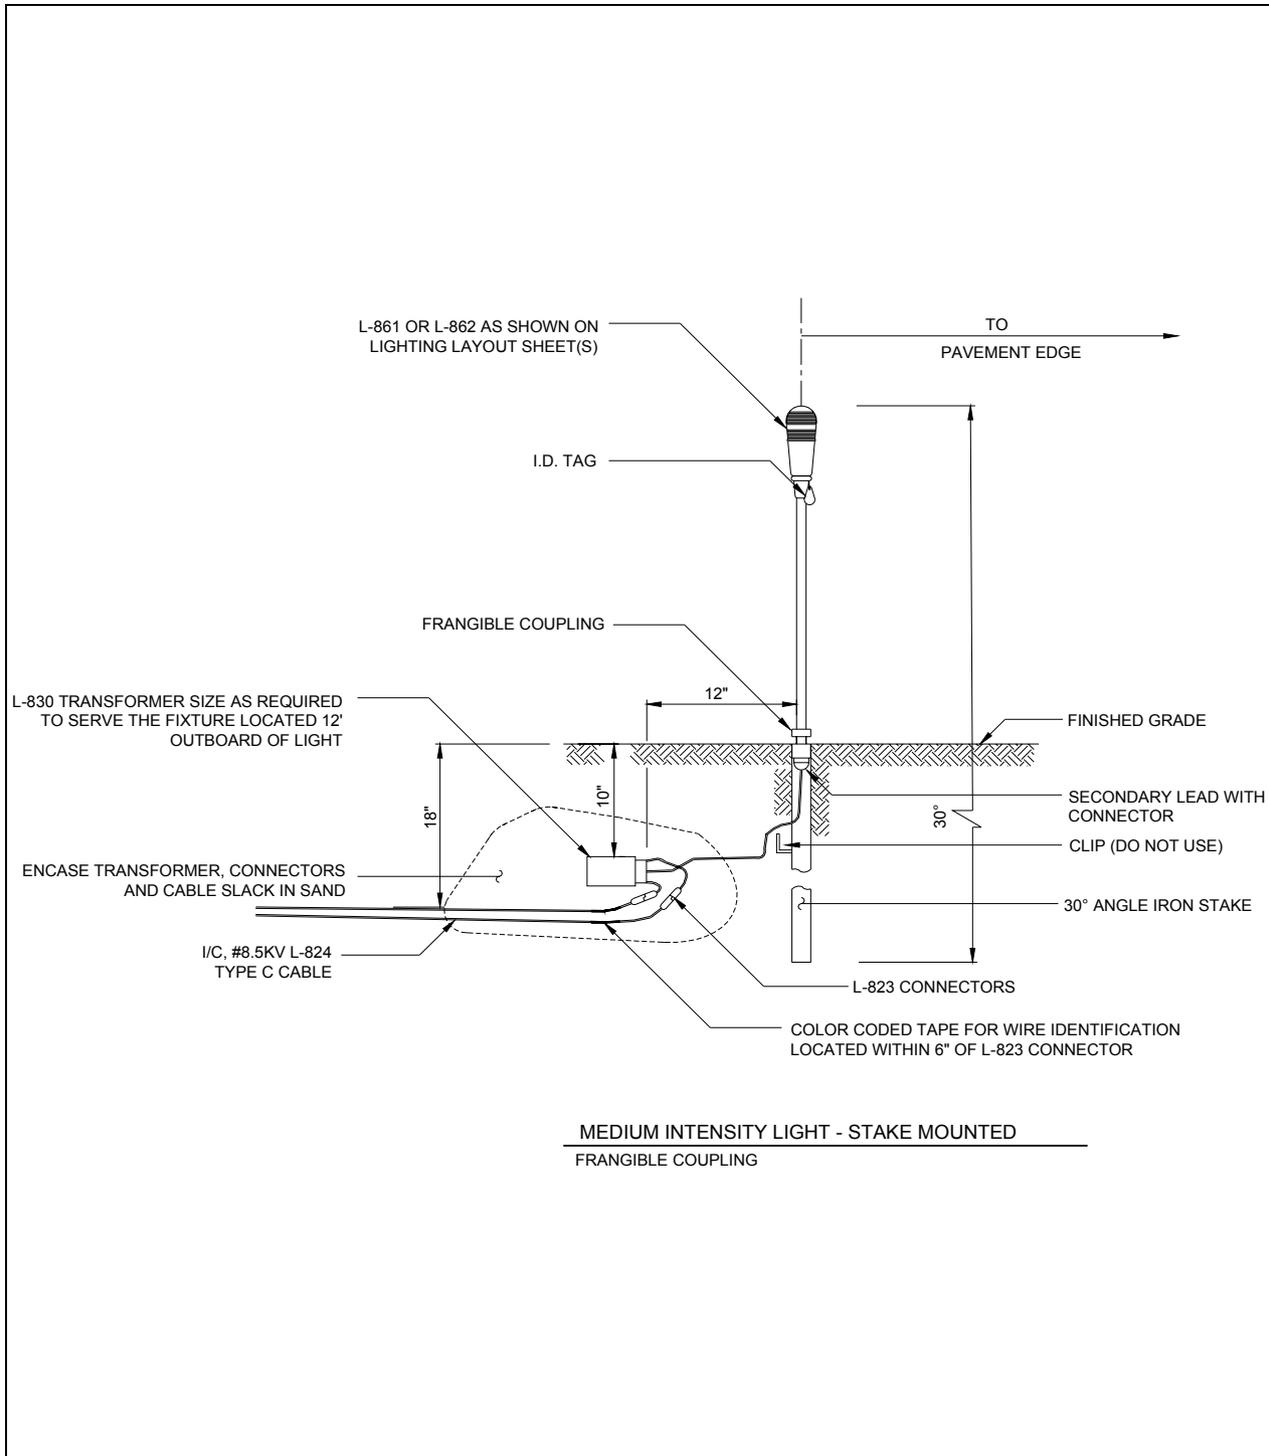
Typical Standard Details for Runway & Taxiway Edge Lights –Medium Intensity Light – Stake-mounted
